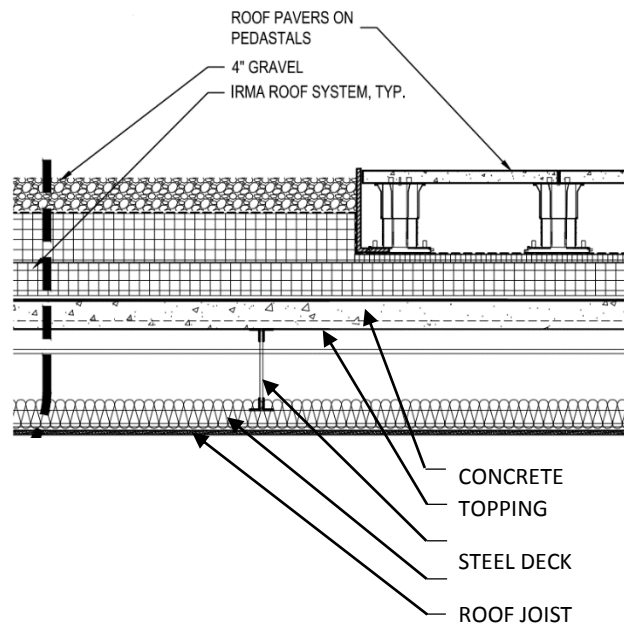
Section through roof at the 12th floor terrace level. From 3/A4.09.
